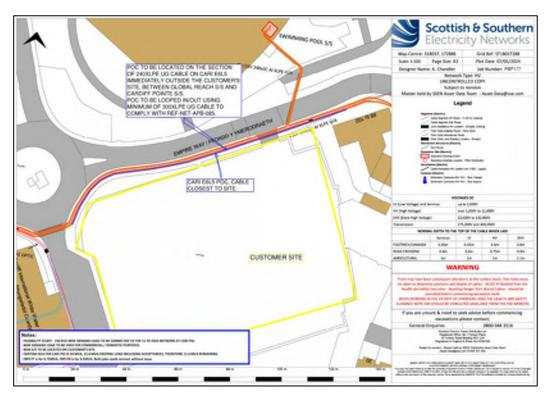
SSEN 750kVA Point of Connection Plan within Empire Way
